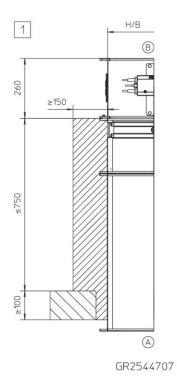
Mortar-based installation with concrete base into a solid ceiling slab
